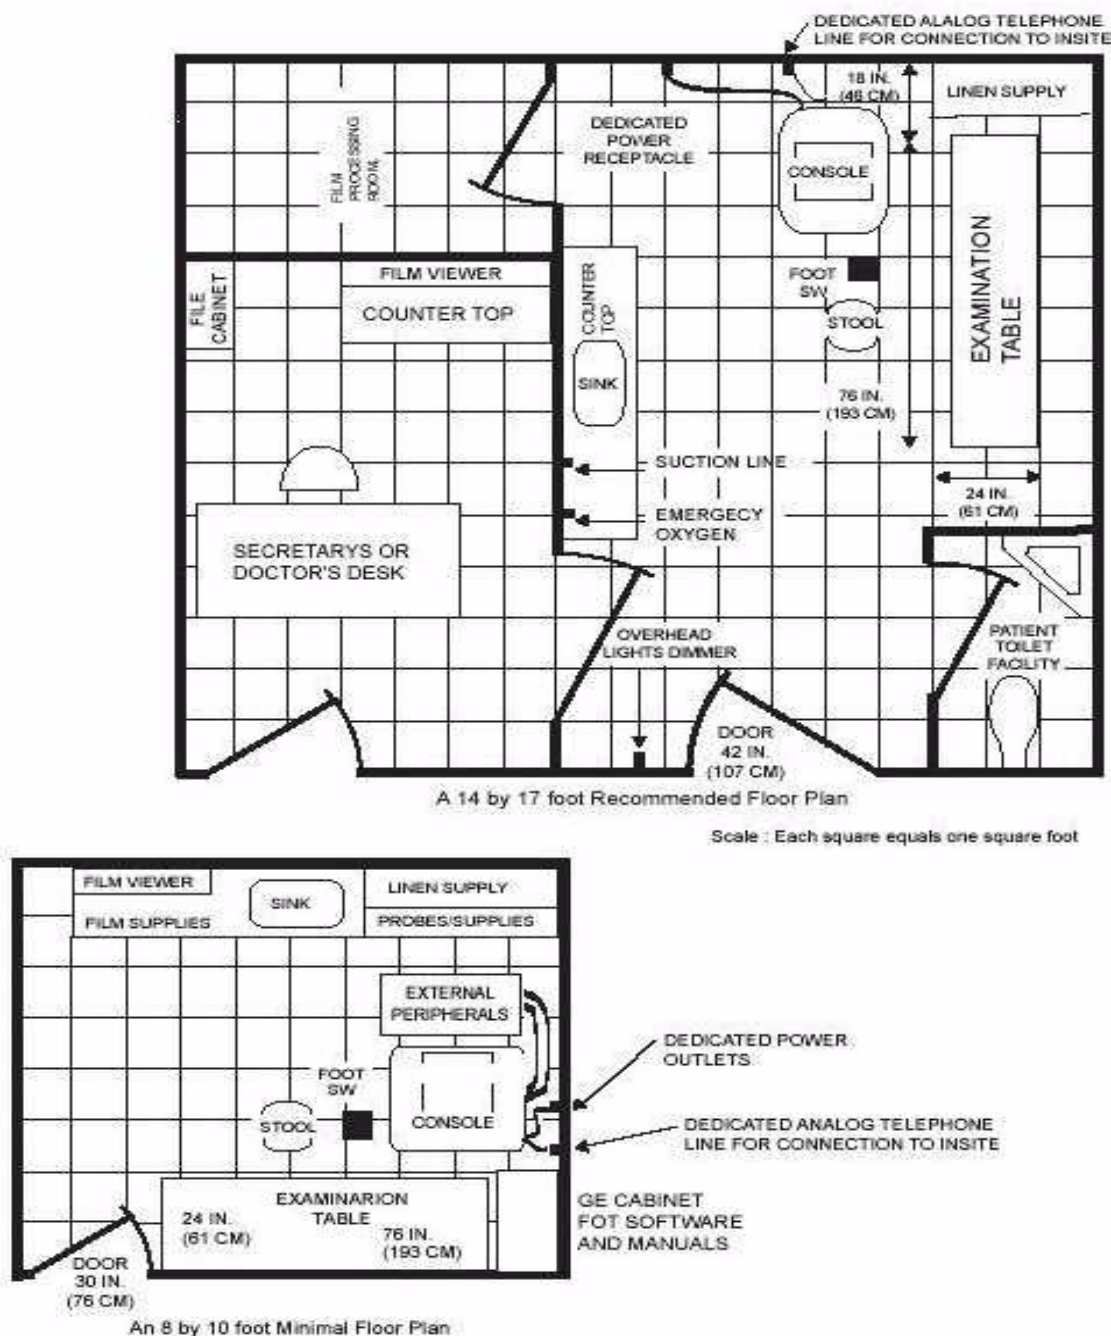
RECOMMENDED ULTRASOUND ROOM LAYOUT
